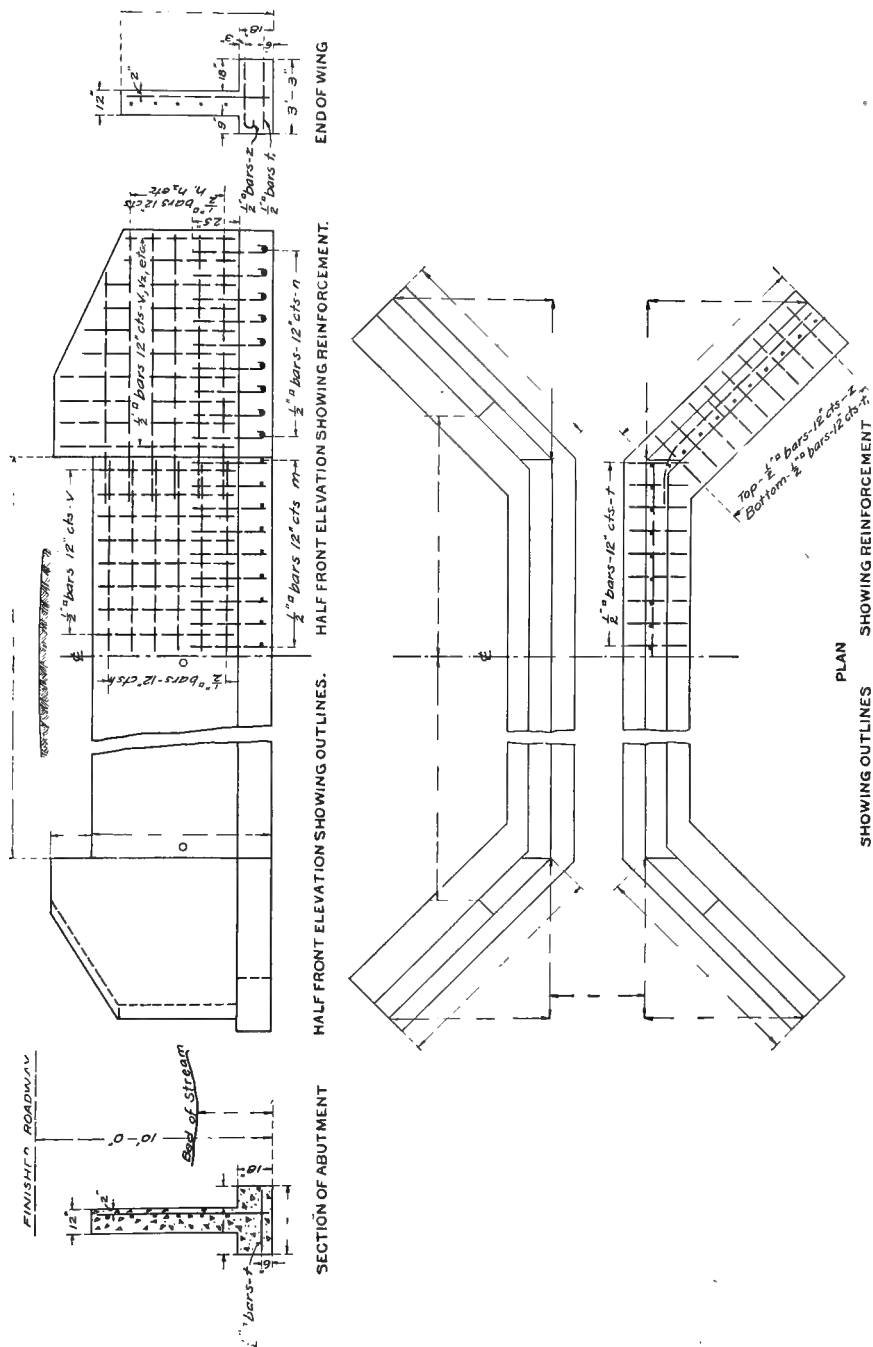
Concrete Sub-structure of 10 feet over all height. Designed by the Illinois Highway Commission.
